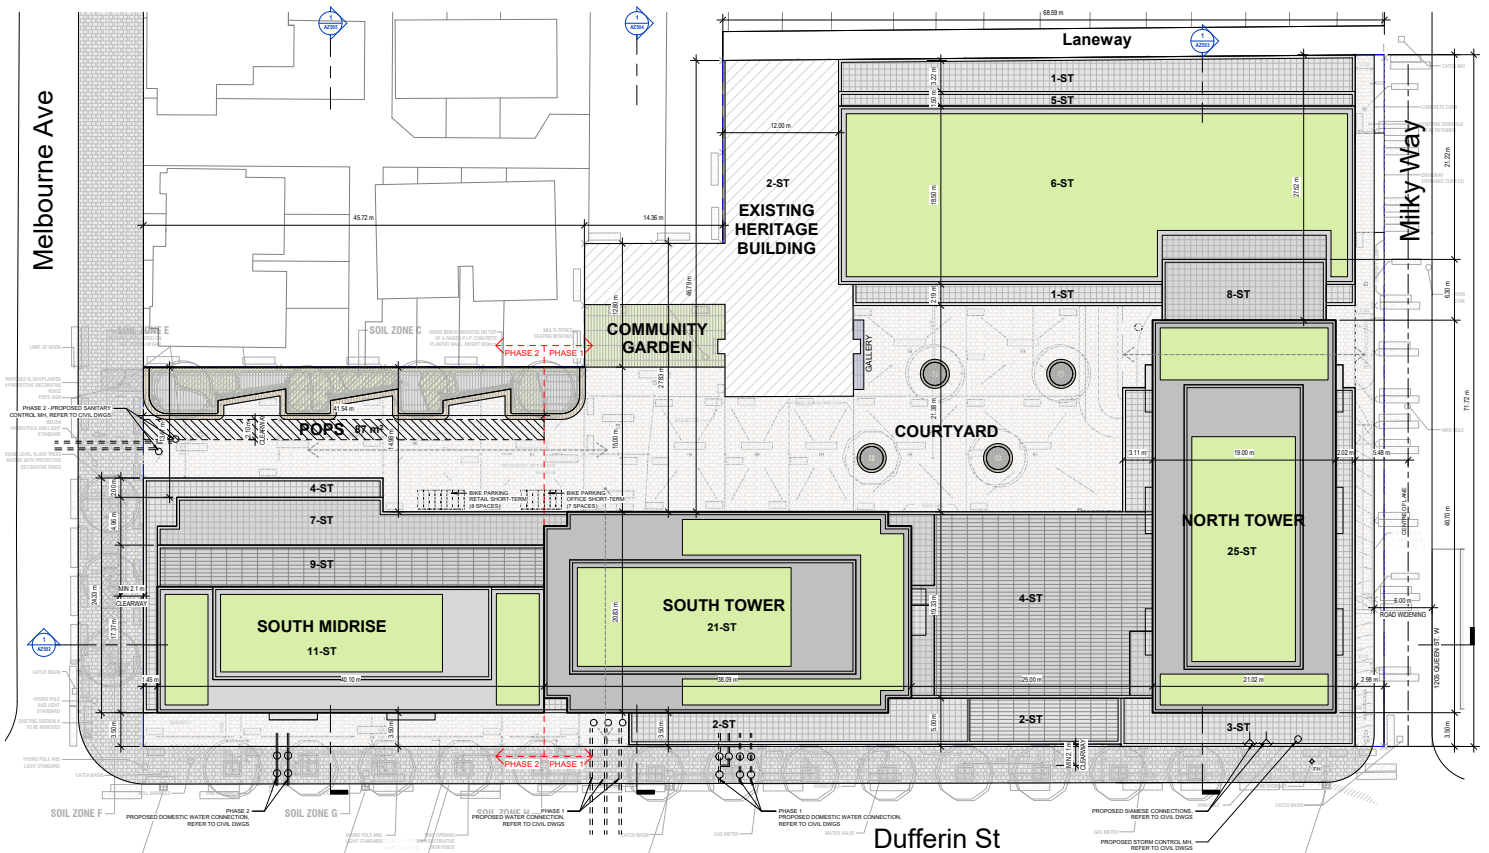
Site Plan (Prepared by Sweeny&Co Architects)
